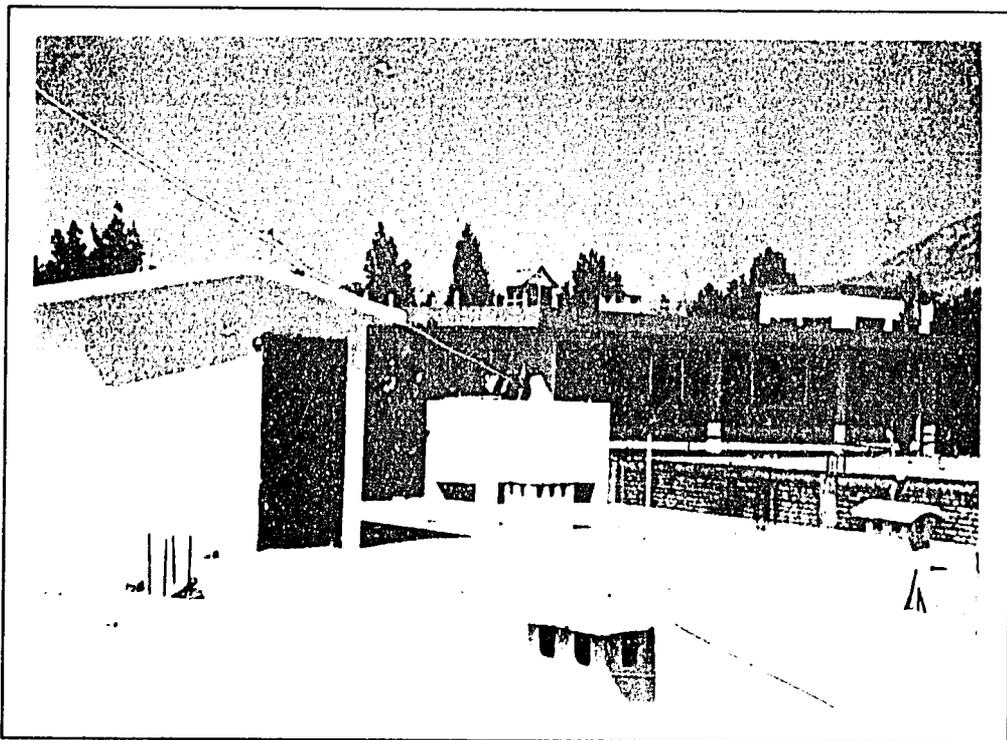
Quetta MSH Office Facility. View looking North. Entrance to roof area on left.
